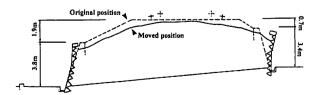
Typical damage to masonry RW; embankment for Main Line of Hanshin Railway Co. adjacent to Nishi-Nada Station (Site MS2 in Fig. 2)
